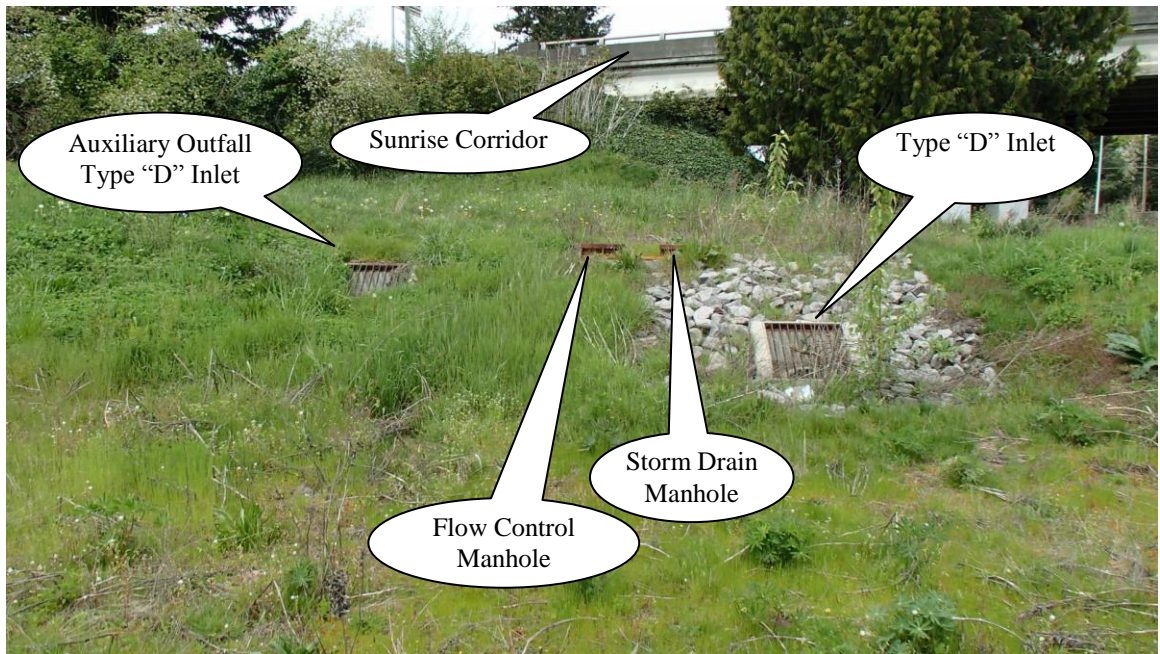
a view of bio-retention pond, looking North toward Sunrise corridor.
